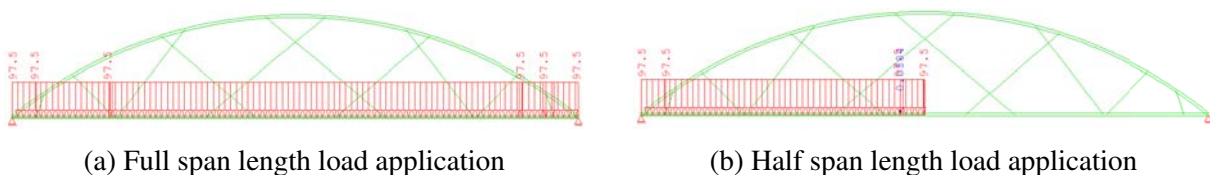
The traffic load application on (a) full span and (b) half span on an example bridge.
